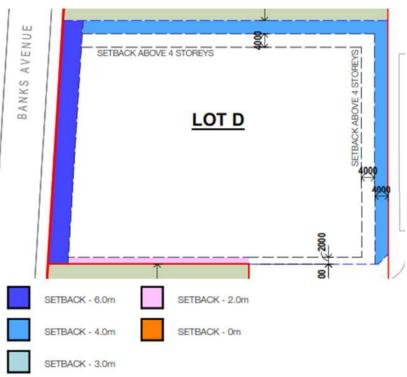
Building setbacks extract for Lot D from approved Concept Plan (DA-2019/386)
